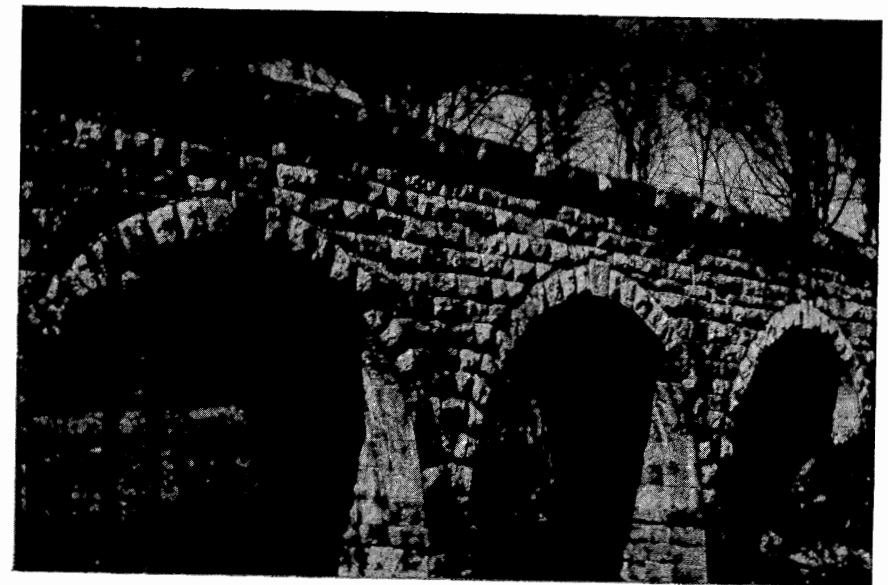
Railroad bridge south of Staunton built by the Valley Railroad in 1874.
